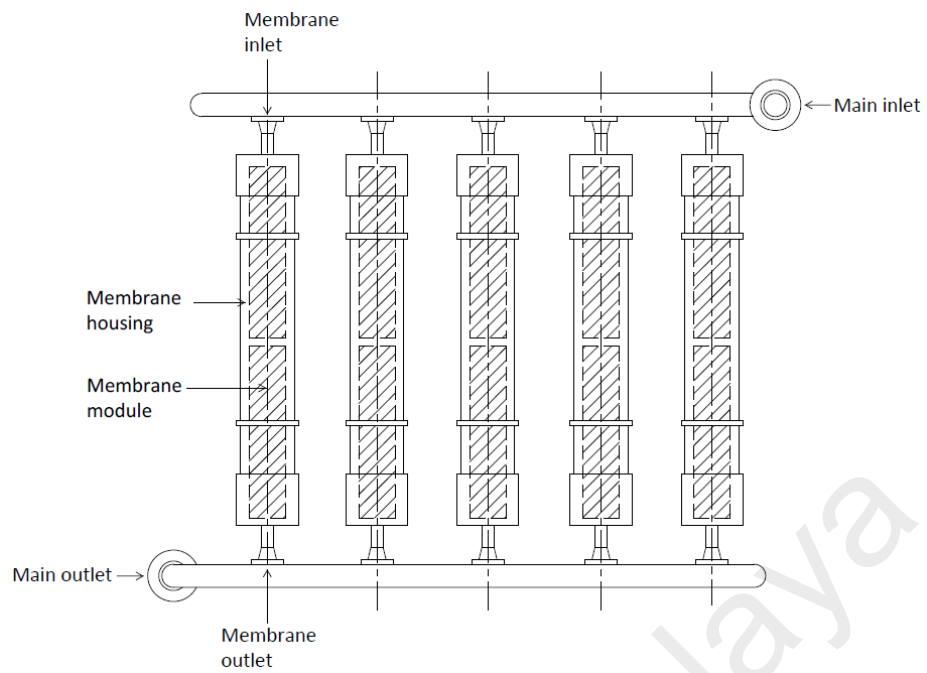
Typical 2D sketch of a membrane component (plan view)
